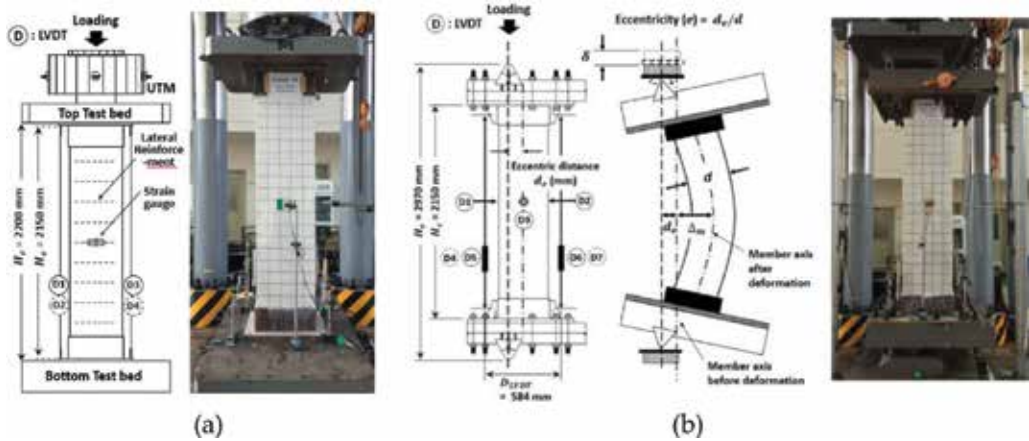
Test setup of compressive loading tests: (a) concentric axial loading and (b) eccentric axial loading.
